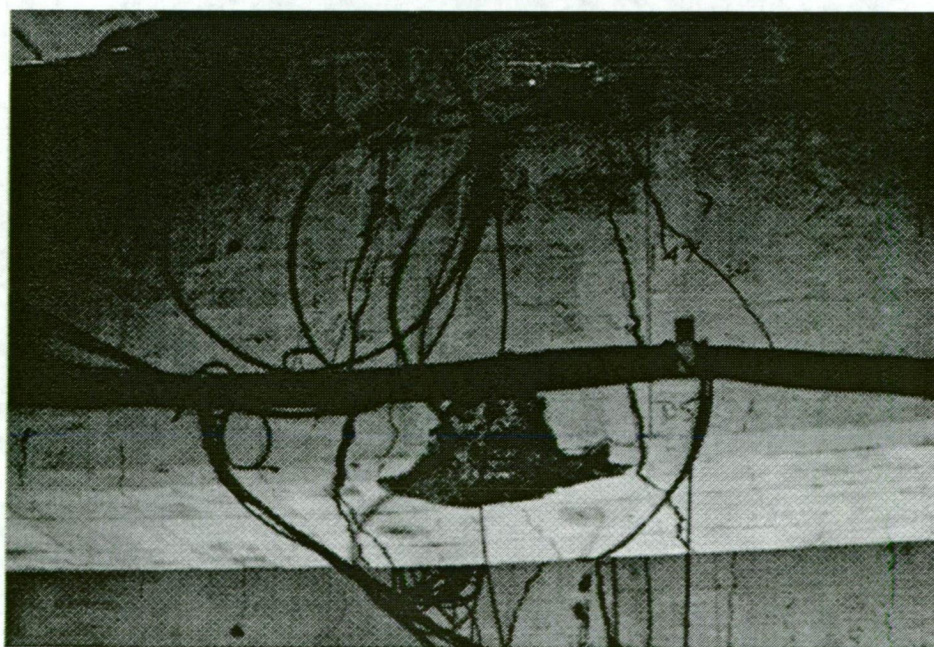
Cracking of Second Beam at Ultimate Load
